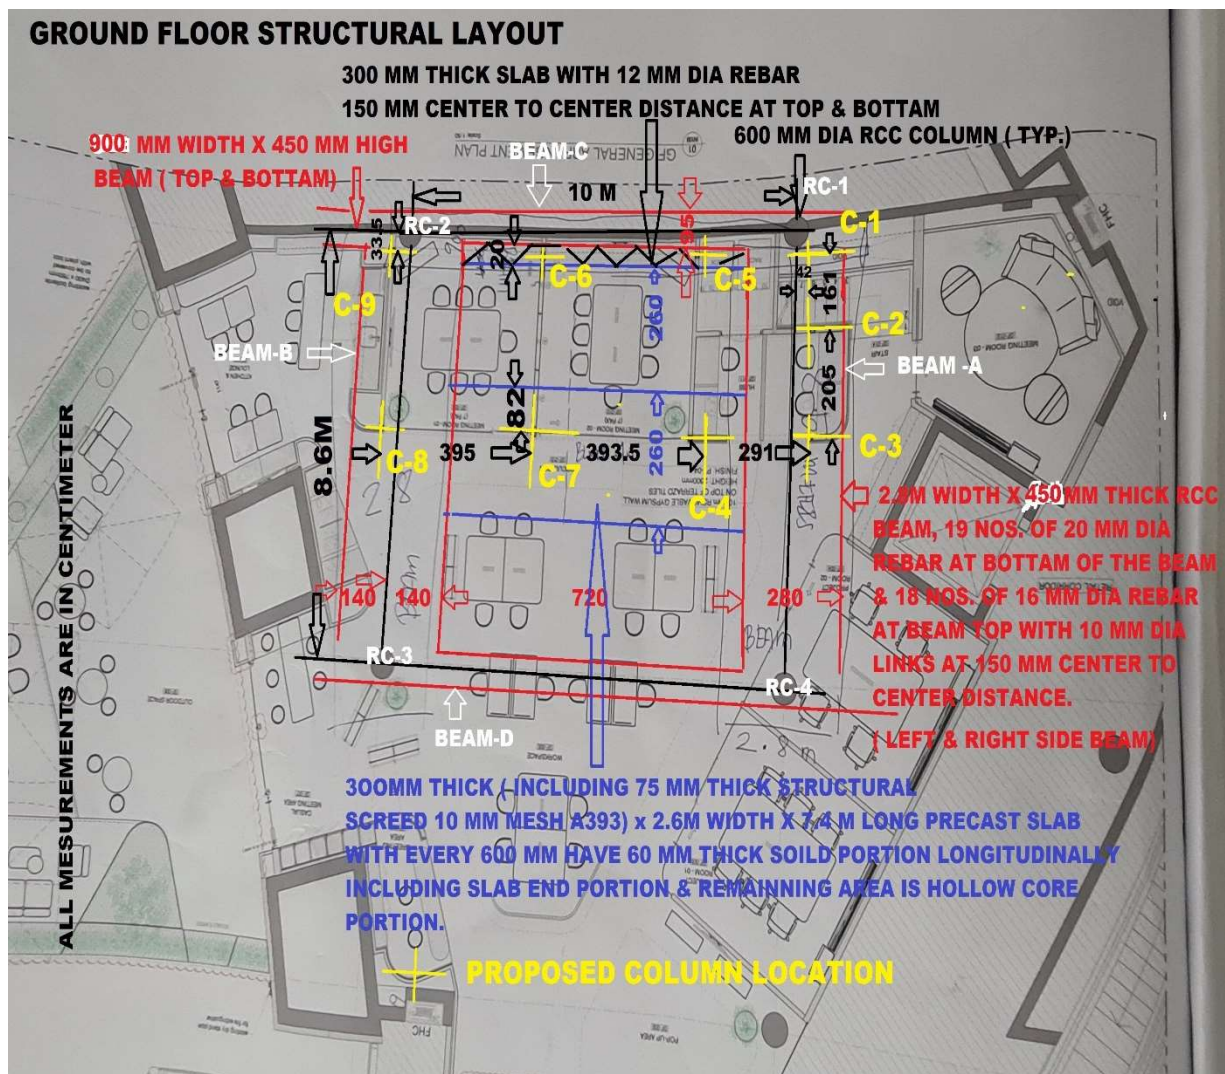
Beams, Precast Slab, Solid Slab & Proposed column locations layout of Ground floor level
